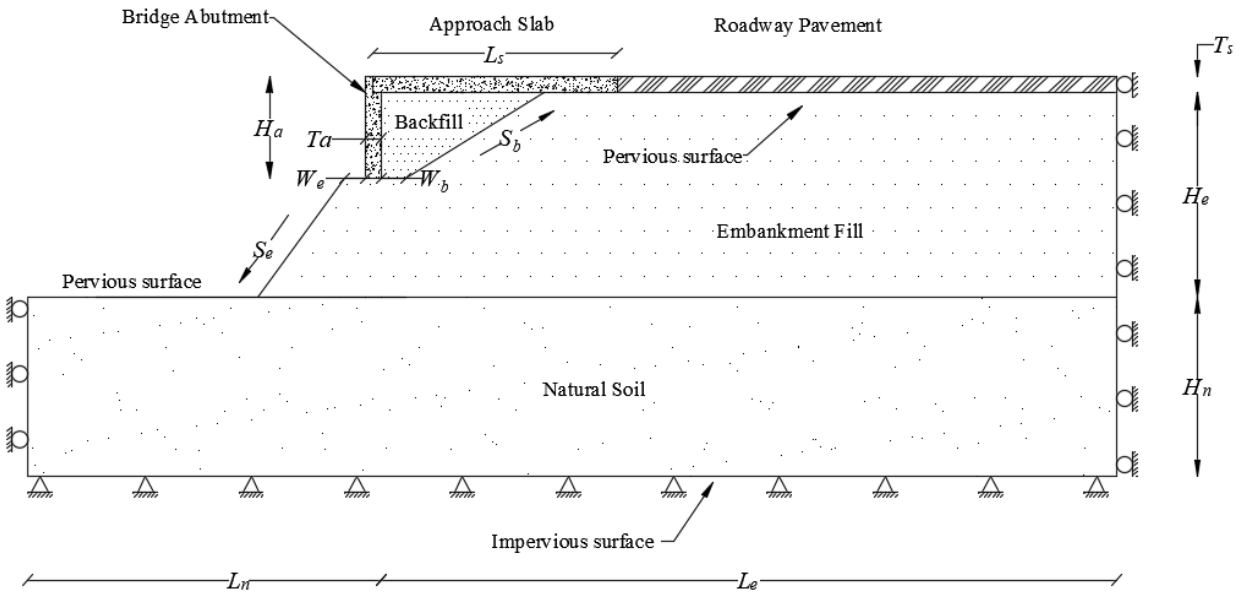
Layout of the two-dimensional longitudinal model with stub abutment
